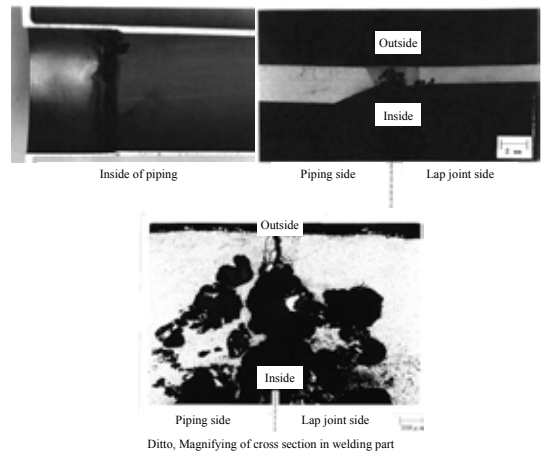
Pitting corrosion generated in welding part of stainless steel pipe hot water supply, about 2 years use, 755Su(65A)²⁾
